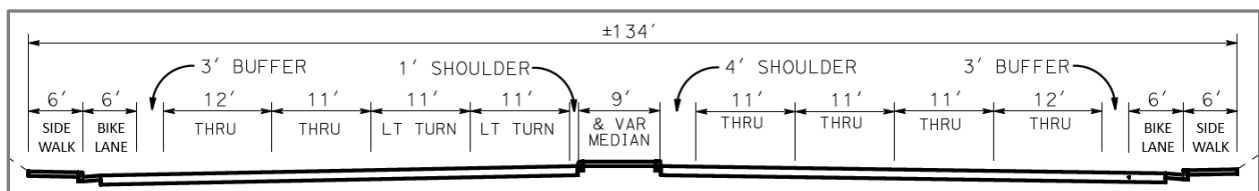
Alternative 2 – Middlefield Road Cross-Section
